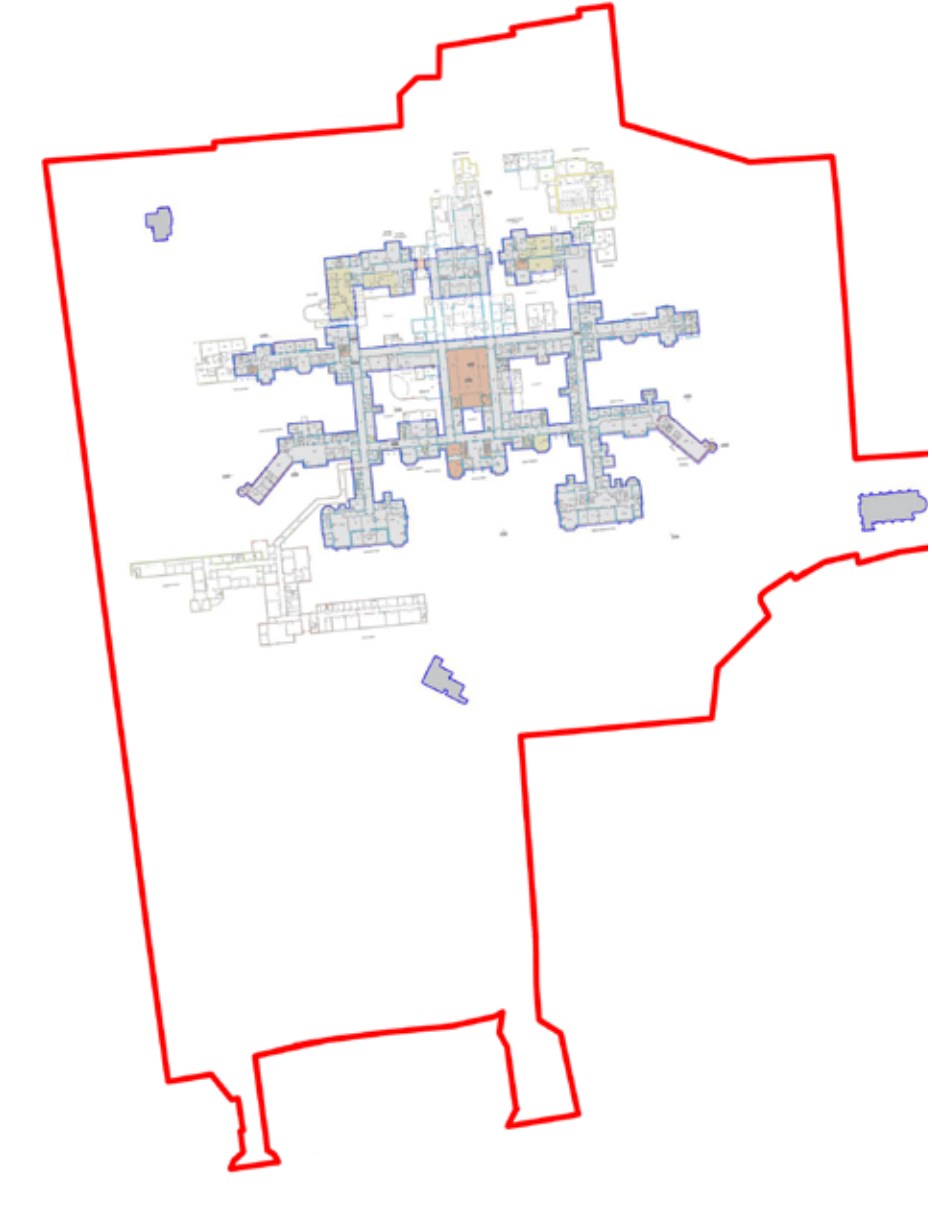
Sketch Plan showing the Building Heritage Hierarchy
